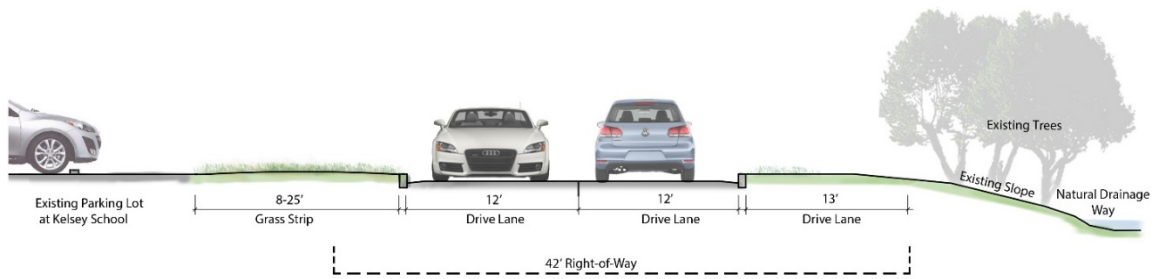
Section C-C – Existing Street Cross Section (By author)
